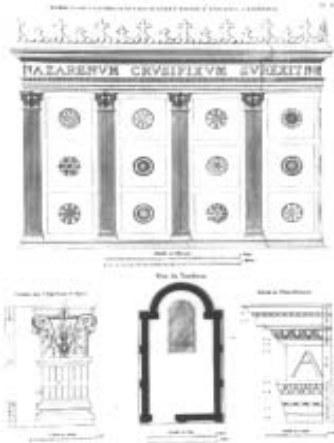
A. Grandjean de Montigny, A. Famin. Side elevation of the Sepulcher, plan and some details. The more evident “mistake” is visible in the plan, where the Sepulcher apse is drawn as it would be empty, while the internal wall is actually plane – published in: Renaissance Italienne, Architecture Toscana, Paris 1814.
